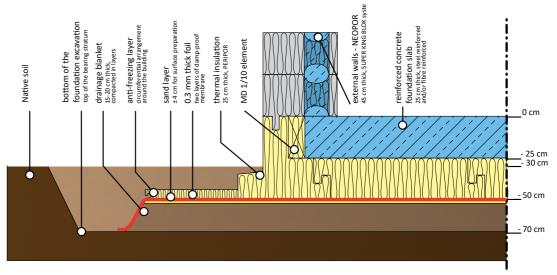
Schematic construction of the slab foundation with 45 cm thick external walls (Super King Blok)
